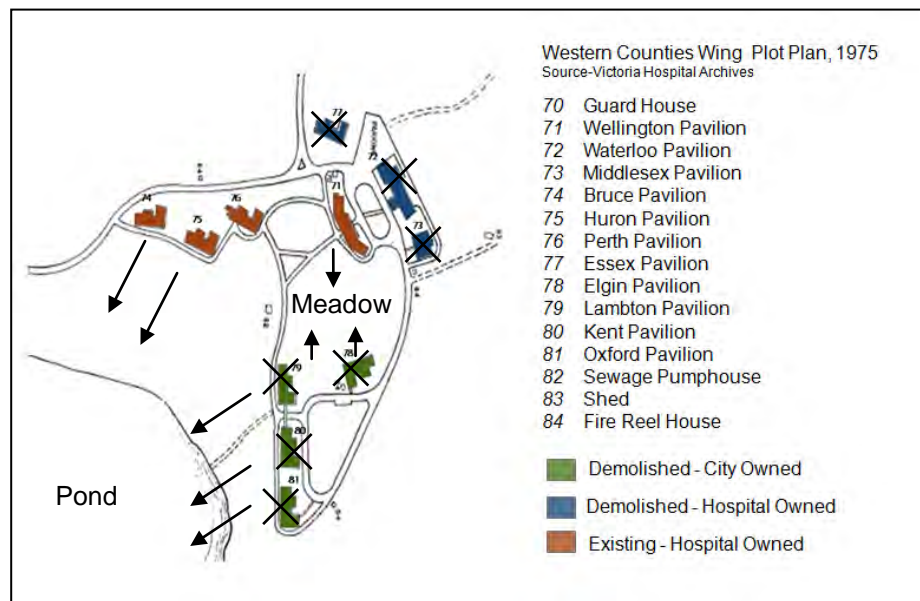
Plan showing layout of Western Counties Centre. Arrows denote views to pond and meadow. Plan source: Historica Research, 2000.
